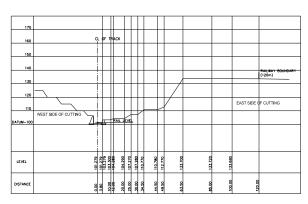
Cross Section at km. 209/160 (Pomendi Cutting / East Side)
